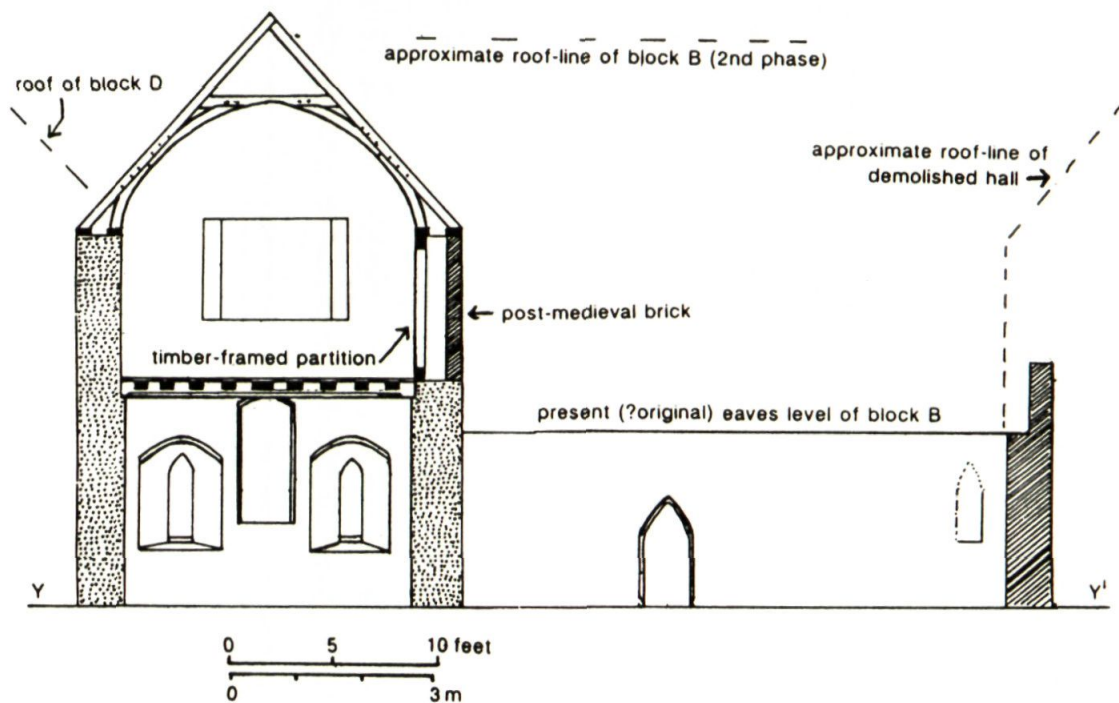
A cross section through block C, showing the west elevation of block B. Note the timber partition which separated blocks B and C at first-floor level. (In section, brick walling is cross-hatched and stone is stippled.)
